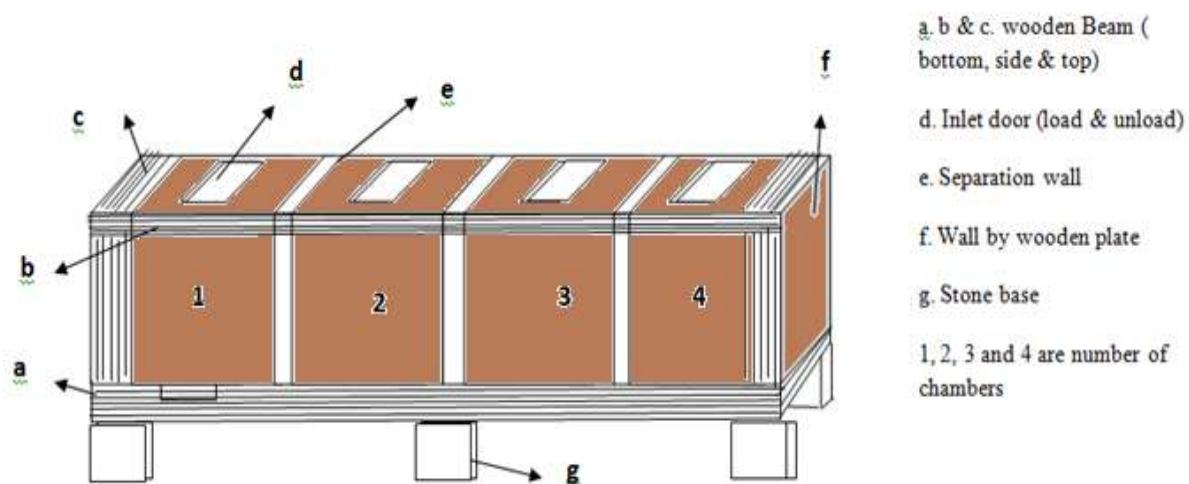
Schematic diagram of Panatha made by wood four chambered structure without roof.
